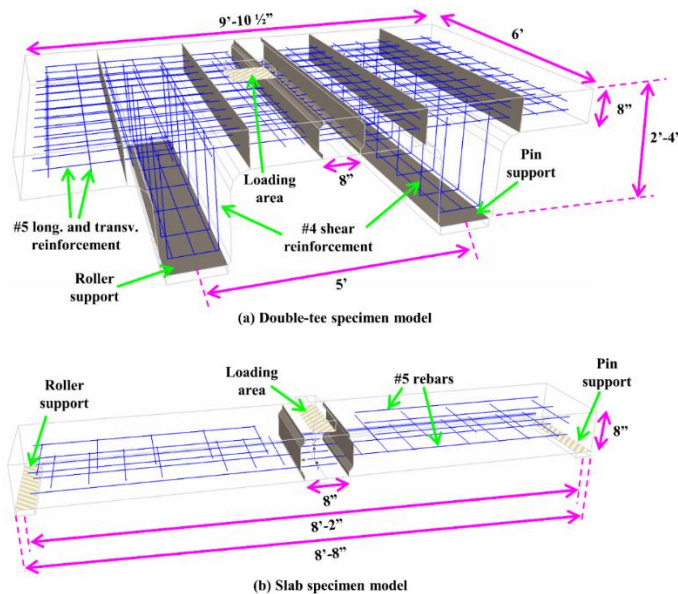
Geometry, reinforcement, boundary conditions, and applied loading of slab and double-tee models
